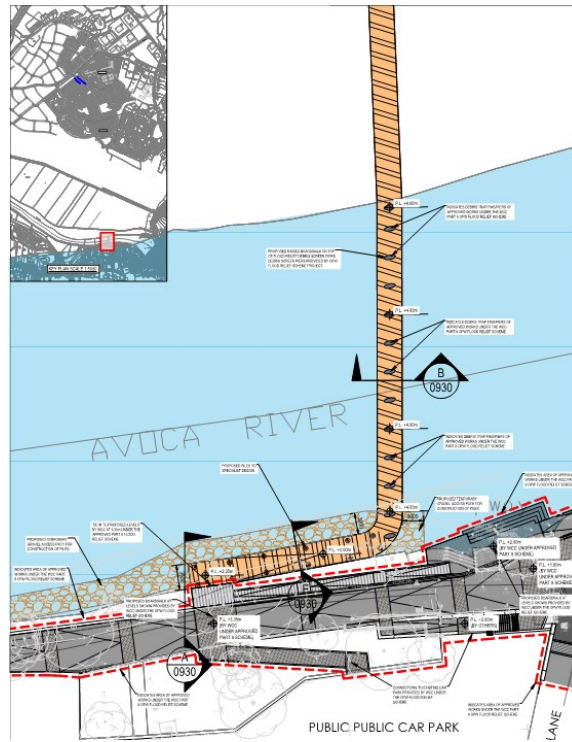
Extract from DOBA Engineering drawing C-0920 illustrating the Proposed Boardwalk Route crossing on the Permitted Debris Traps.
